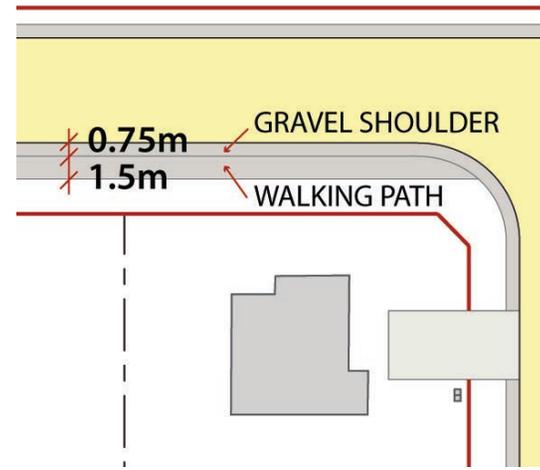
Dedicated walking paths located within road rights-of-way should be at least 1.5 metres wide, plus the width of the gravel shoulder, for a total of 2.25 metres. Vertical barriers (e.g. bollards or boulders) can be placed in the shoulder to protect pedestrians from vehicle traffic.
